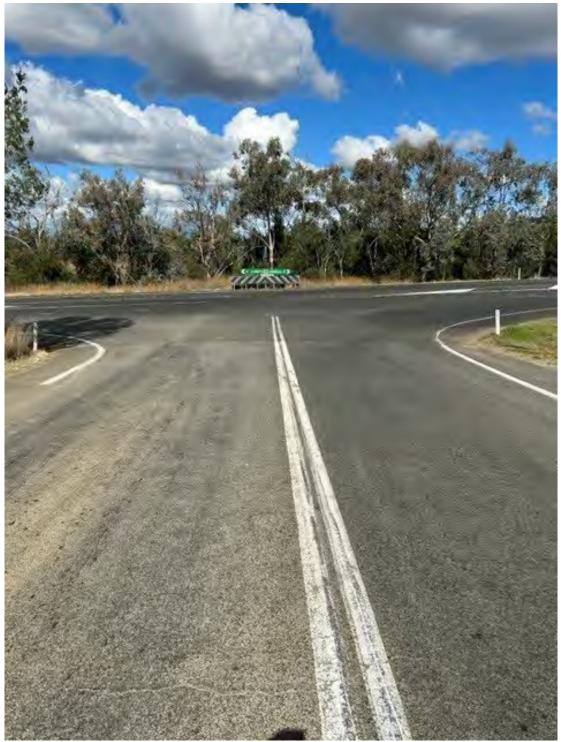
Rushes Creek Road at its Intersection with the Oxley Highway.
